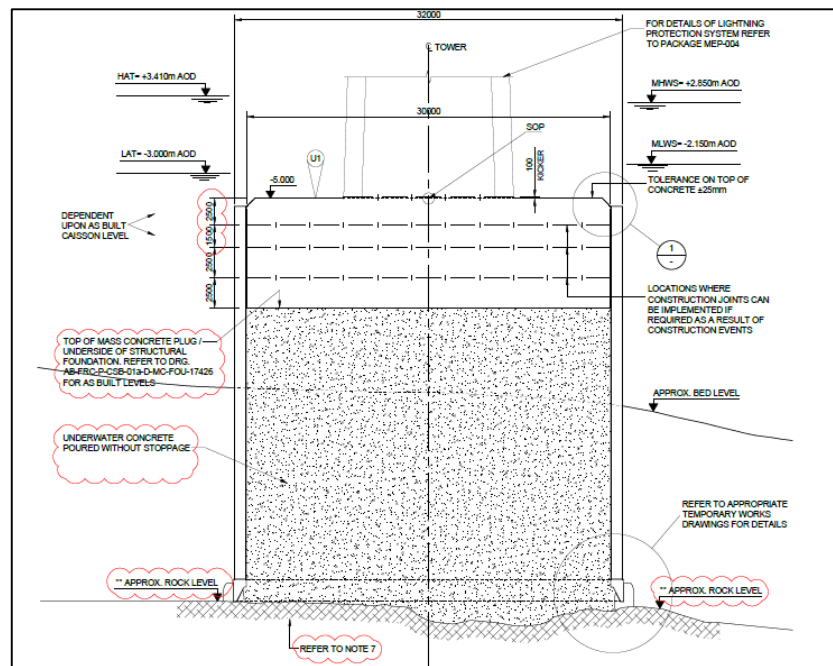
South Tower foundation general arrangement drawing, detailing steel caisson with mass concrete plug (Ramboll ii, 2015)
